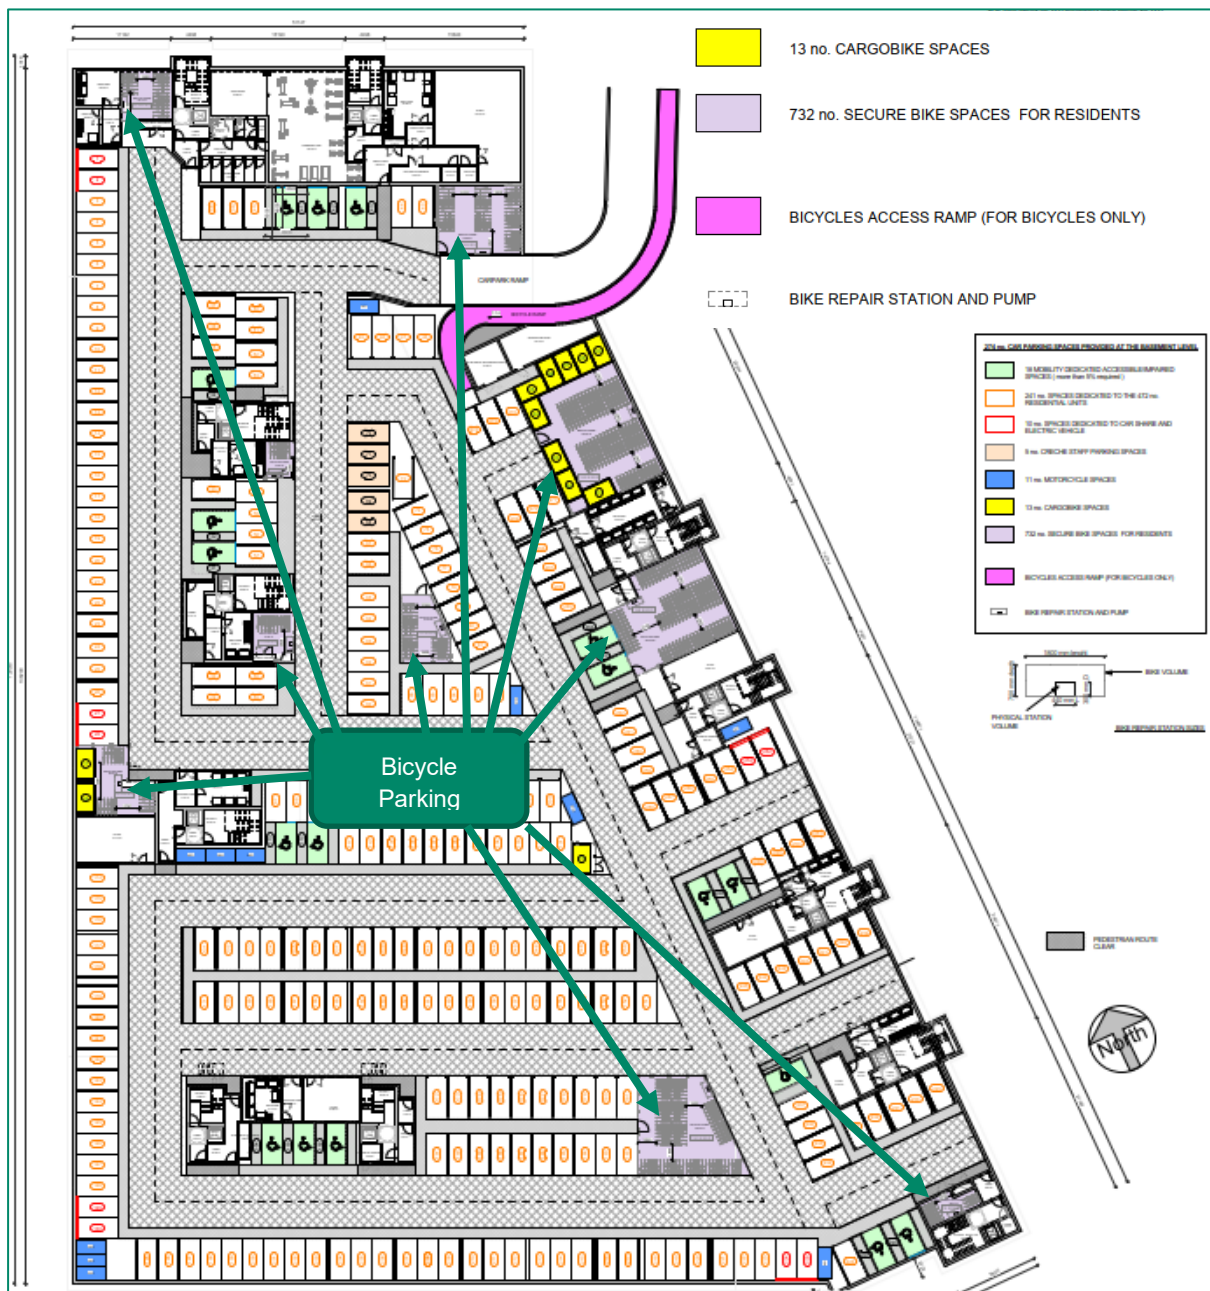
Bicycle Store Parking Basement Layout (Source: C+W O'Brien Architects Drawing No. 092035)
